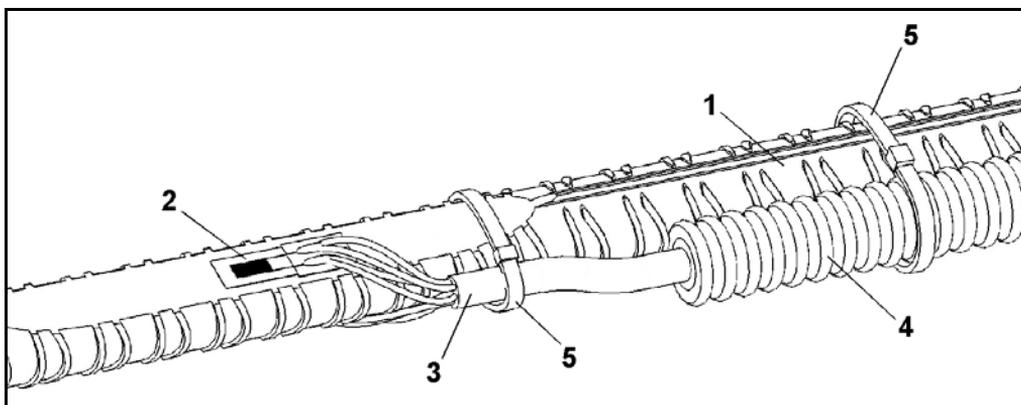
The measurement area of the strain sensor before application of protection coatings: 1 - reinforcement bar; 2 - strain gage with solder points; 3 - connection cable; 4 - PE tube for cable protection; 5 - PE binding element used to fix the cable to the reinforcement bar
